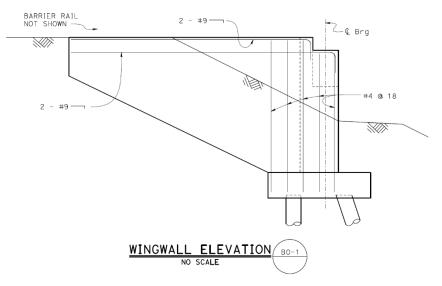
Seat Abutment with Standard Plan Wingwall
